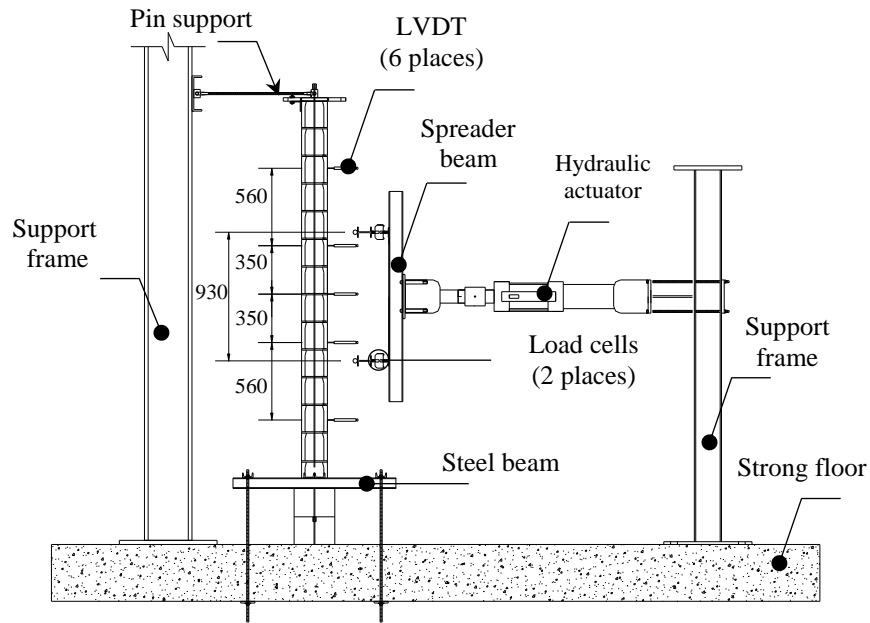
Lateral view of the test frame, LVDT locations, and top and bottom supports (dimensions in mm).
